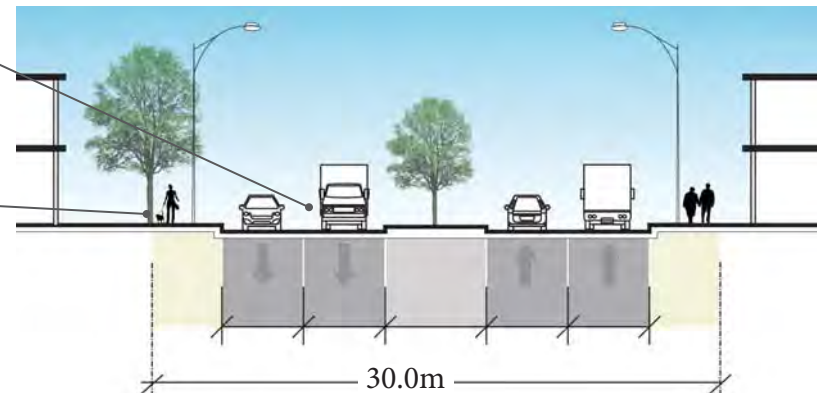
Existing Street Design of Idylwyld Drive (portion)
